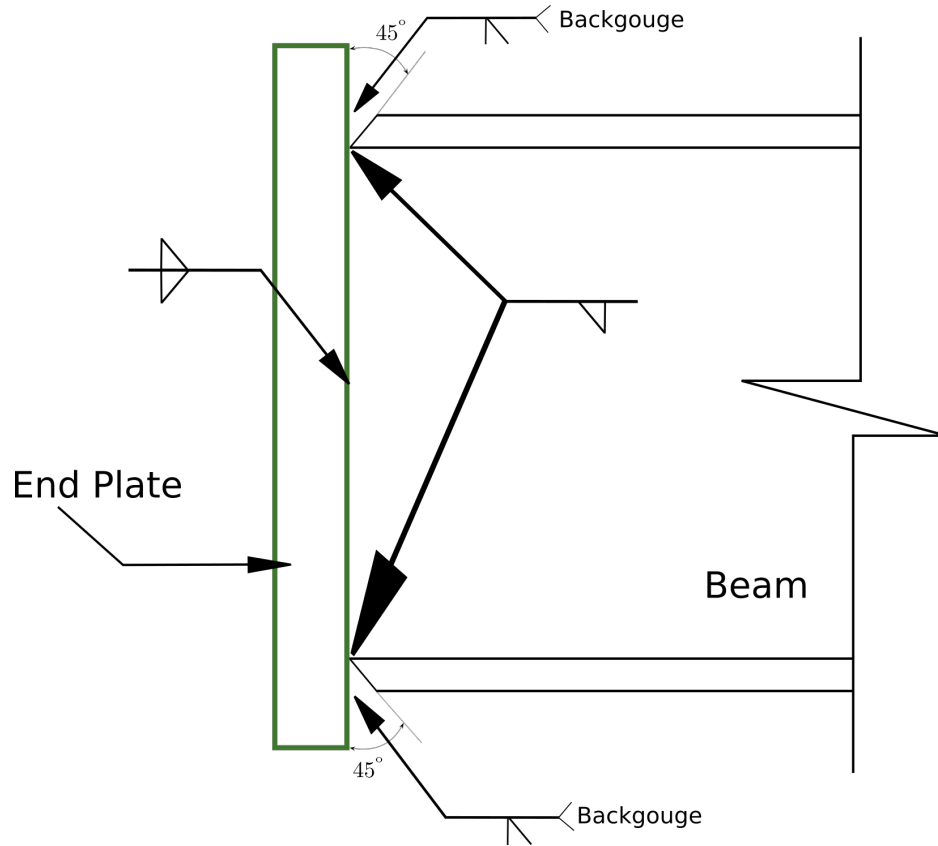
Typical Weld Details - Beam to End Plate Connection
